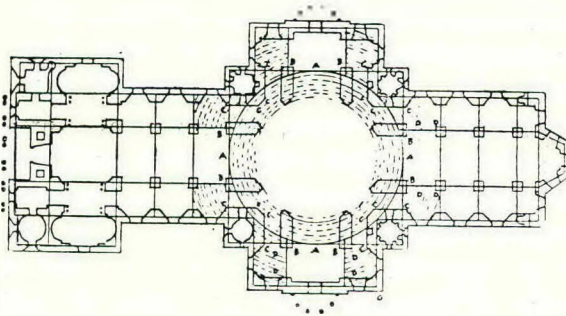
St. Paul's Cathedral. Suggested main lines of reinforcement to be buried in concrete beams in the wall tops; and plan of reinforced concrete truncated cone to underpin the outer and inner drums and spread their weight over the surrounding masses of masonry. None of these measures will interfere with either the external or internal appearance of the building.
